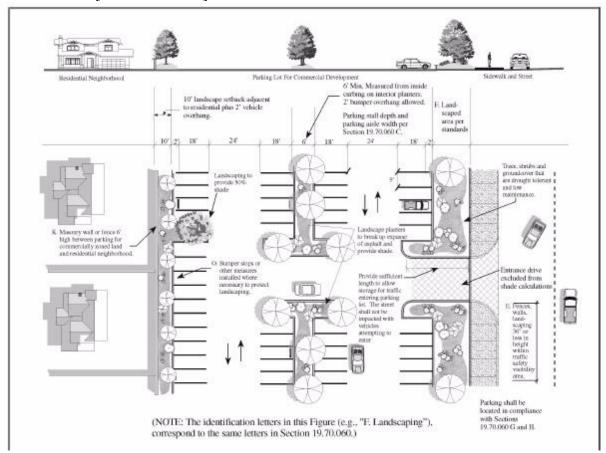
GENERAL PARKING SPACE DESIGN AND LAYOUT STANDARDS
